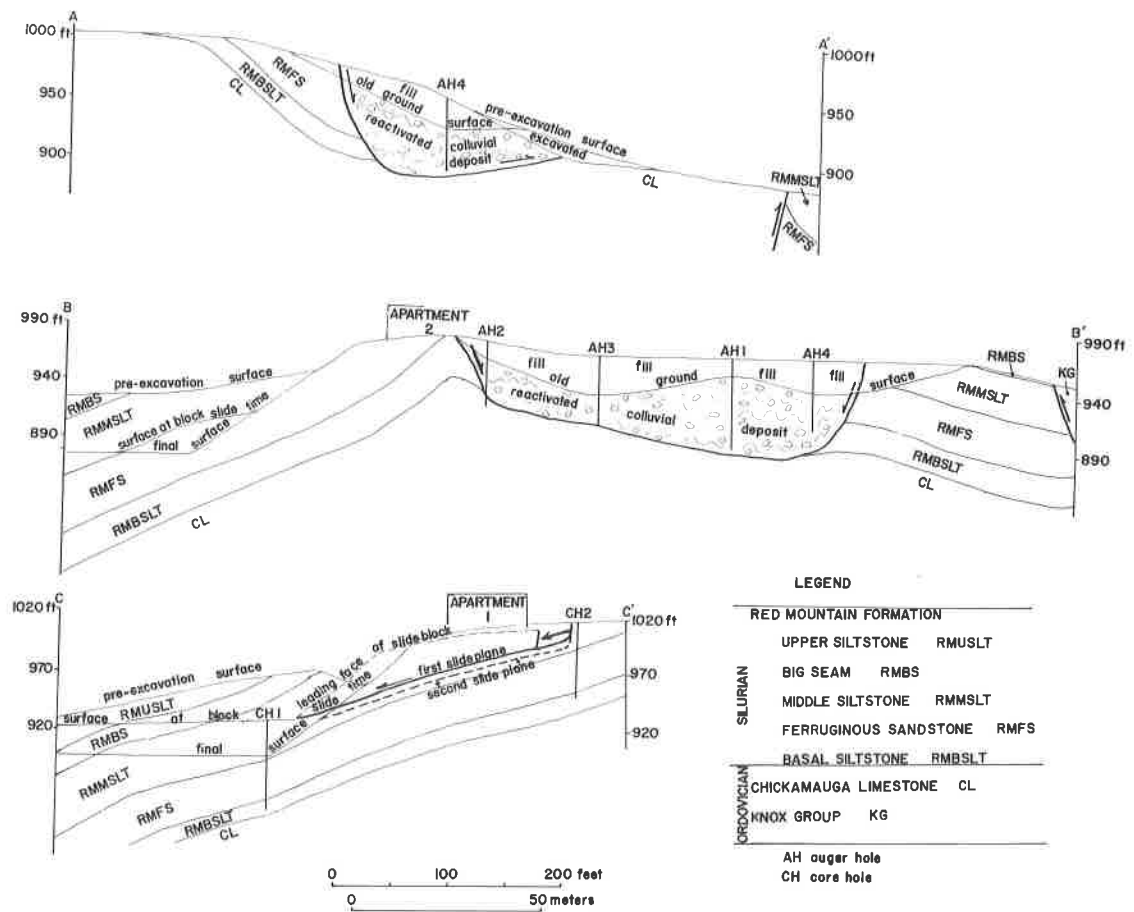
Structural cross-sections through slope failure locations. Section lines shown on Figure 4.
